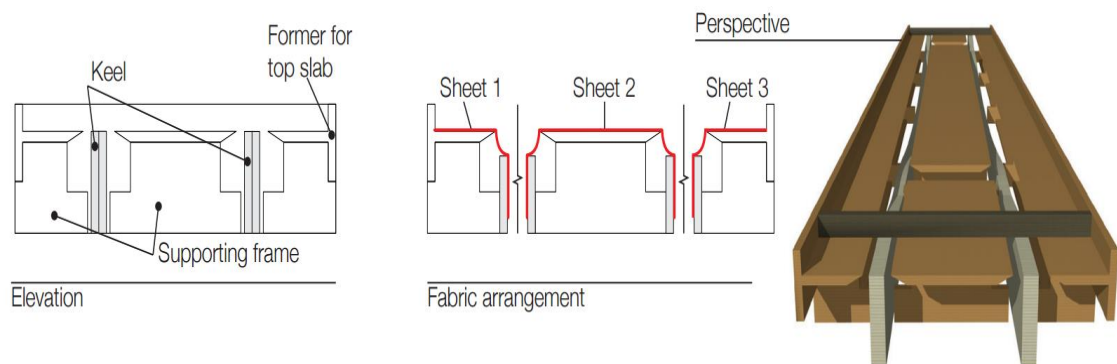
Keel mould used to cast fabric-formed double T-beams by (Orr, 2012)
